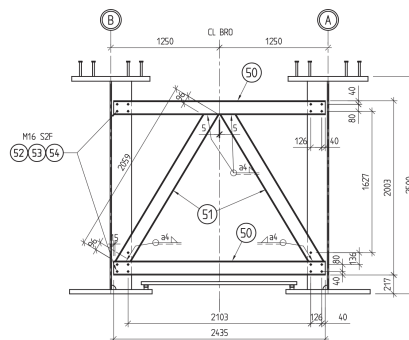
Cross-section of Banafjäl Bridge without the concrete slab. SOURCE: Skanska drawings.
